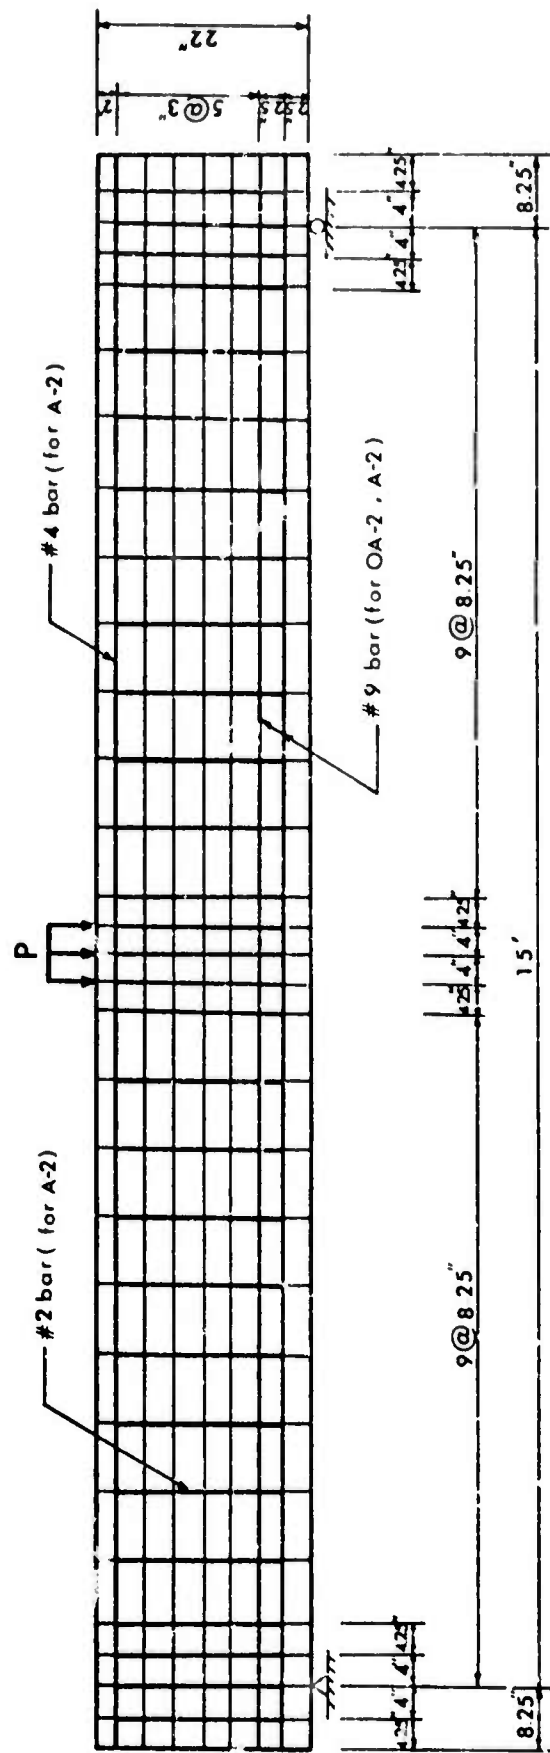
Finite Element Idealization of Reinforced Concrete Beams OA-2 and A-2
